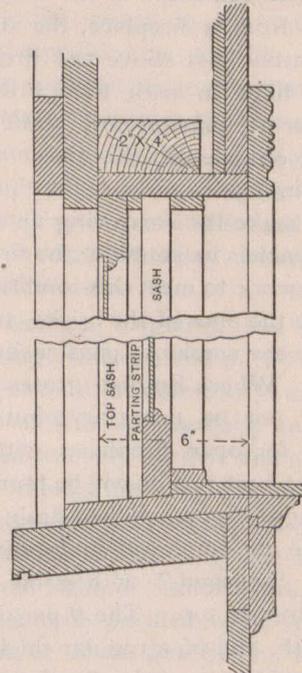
DETAIL OF WINDOW SECTION. Scale, 1 1/2 Inches to the Foot.
